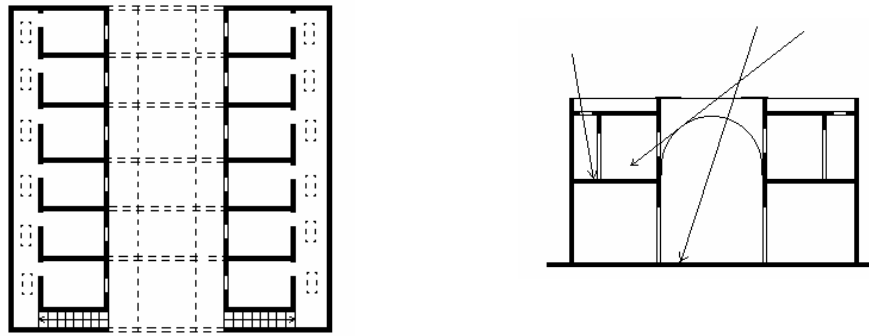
a: Plan and section of a Khan with an open courtyard.
